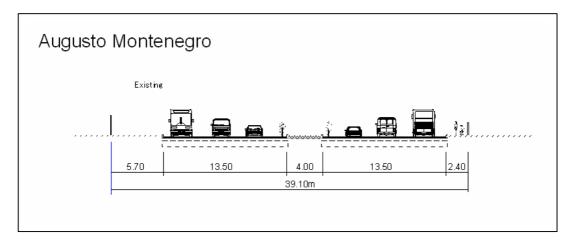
Typical Cross Sections of Rodovia Augusto Montenegro
